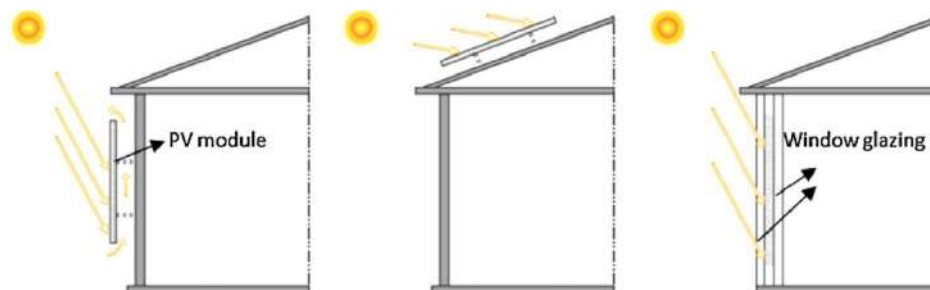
The Application of Photovoltaic Panels on Roofs, Walls and Windows [44].
